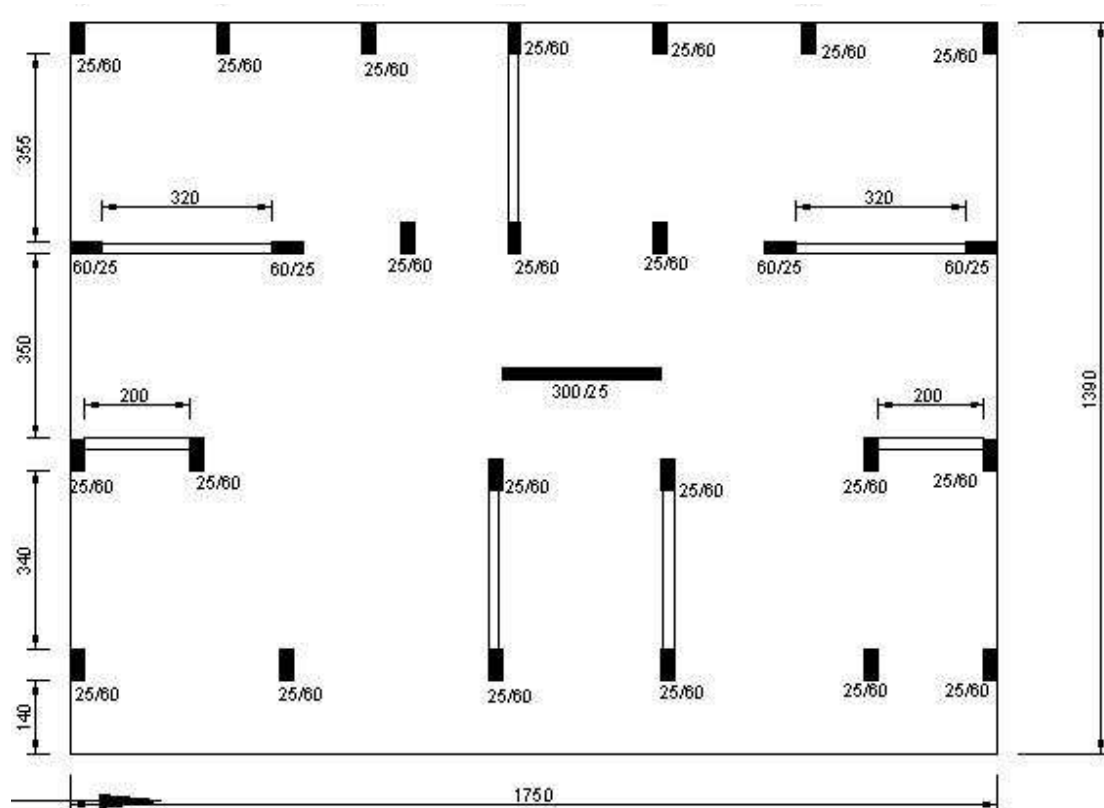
Heavily damaged reinforced concrete frame with shear wall type construction
